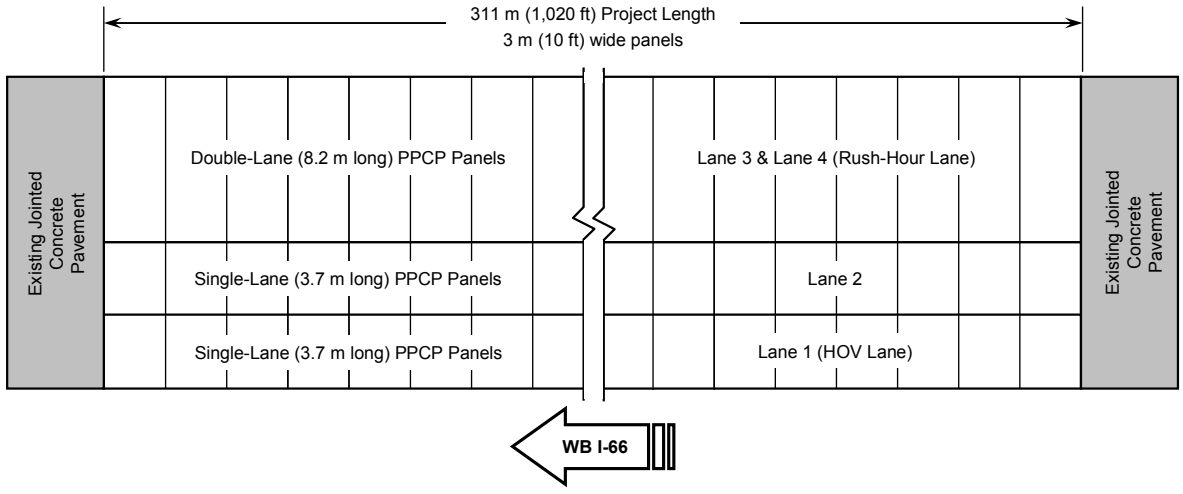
Precast panel layout for the mainline reconstruction using PPCP.
